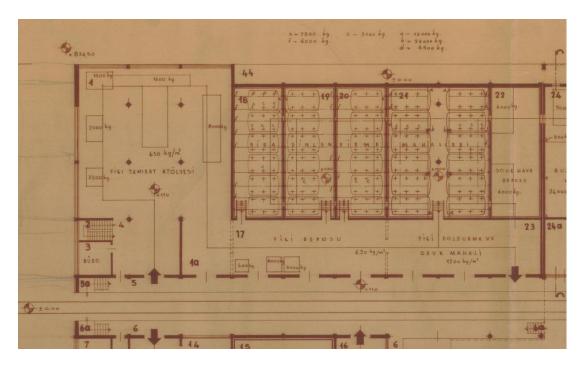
Original drawing of the beer settling building, ground floor plan, Ernst Egli, 1937 (Source: TTA Archive)
